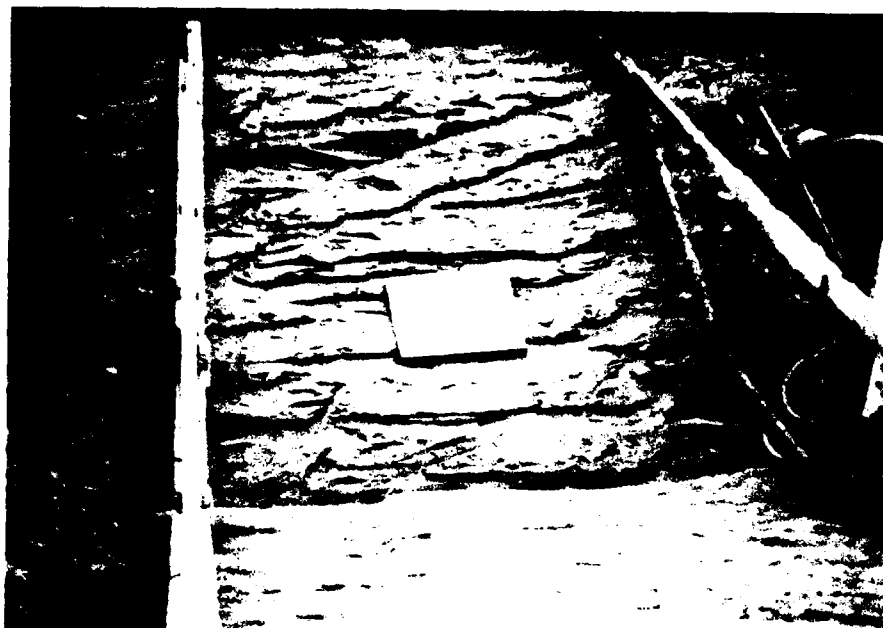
Conduit foundation. Station 26+08 - 26+28 10 Apr 81
